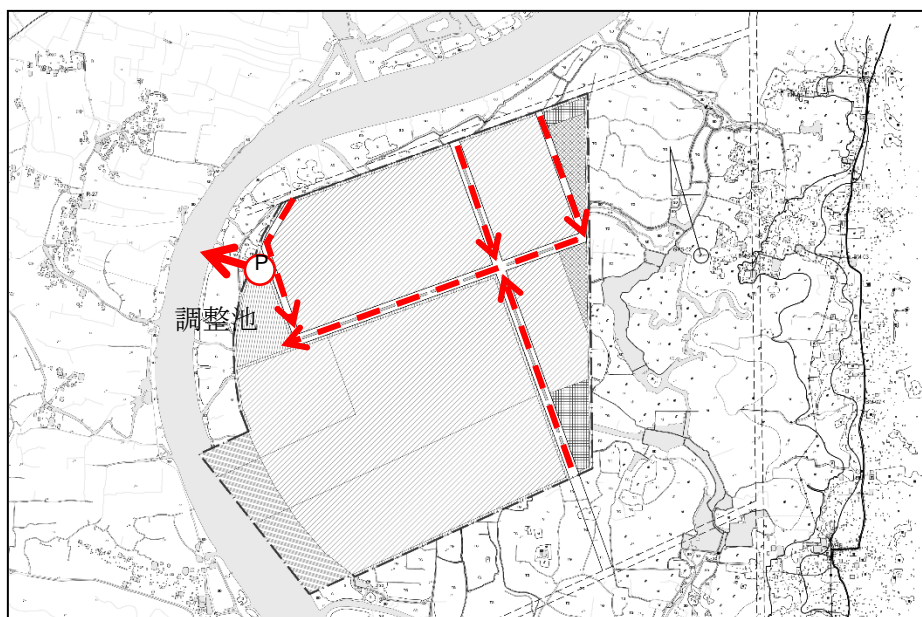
(3)-2 Rainwater drainage plan of Seaboard EZ
